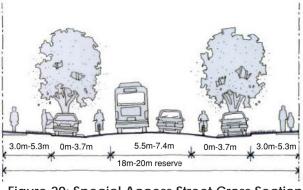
Special Access Street Cross SectionPlan No: 885-524-01Source: Bruce Aulabaugh
